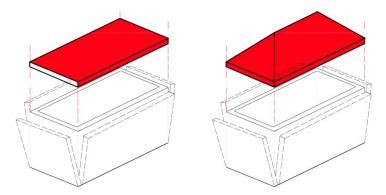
Retrofitting with the realization of a floor or roof diaphragm
